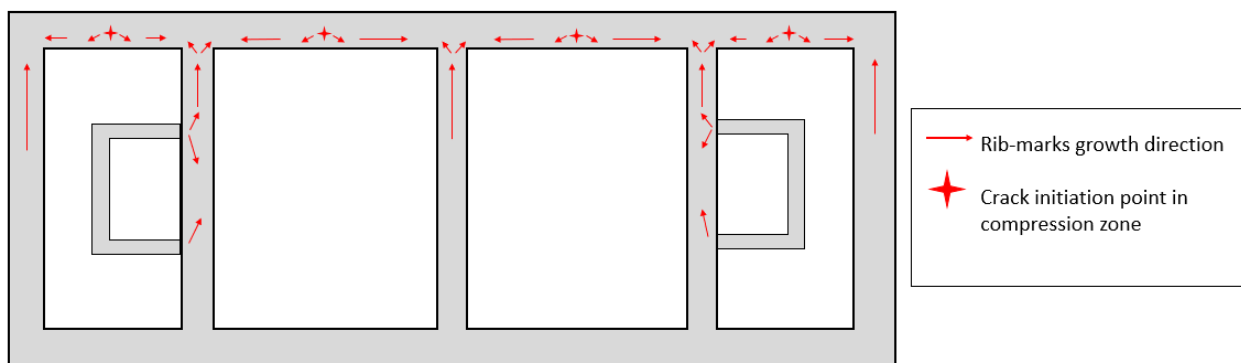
Illustration shows the general crack growth direction based on rib-marks and crack initiation in fracture surface. Illustration made based on observation done on static and fatigue fracture surfaces. Crack leading to failure grows from bottom and up without forming rib-marks.
